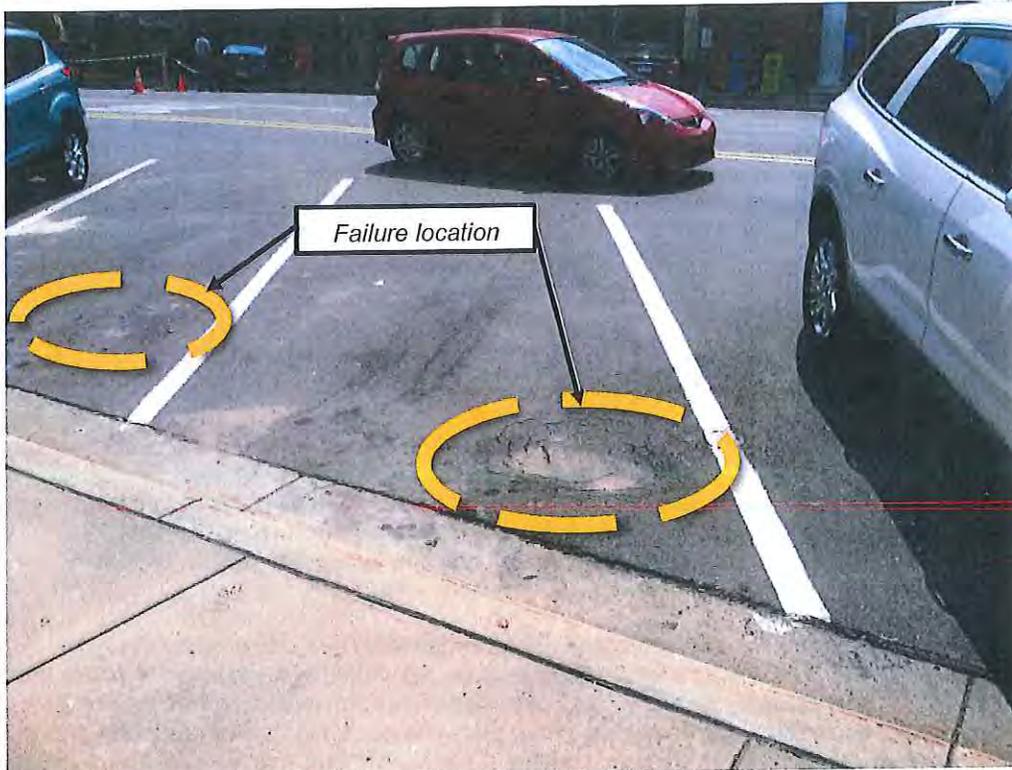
Example of Asphalt Failure in Parking Stall
